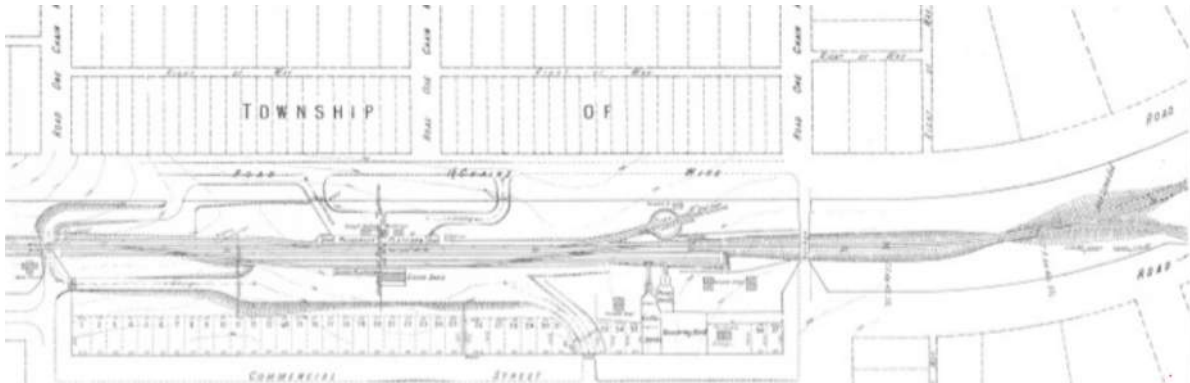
Plan showing the layout of the station in 1893. (Source: Quadratum Architecture 2018)
